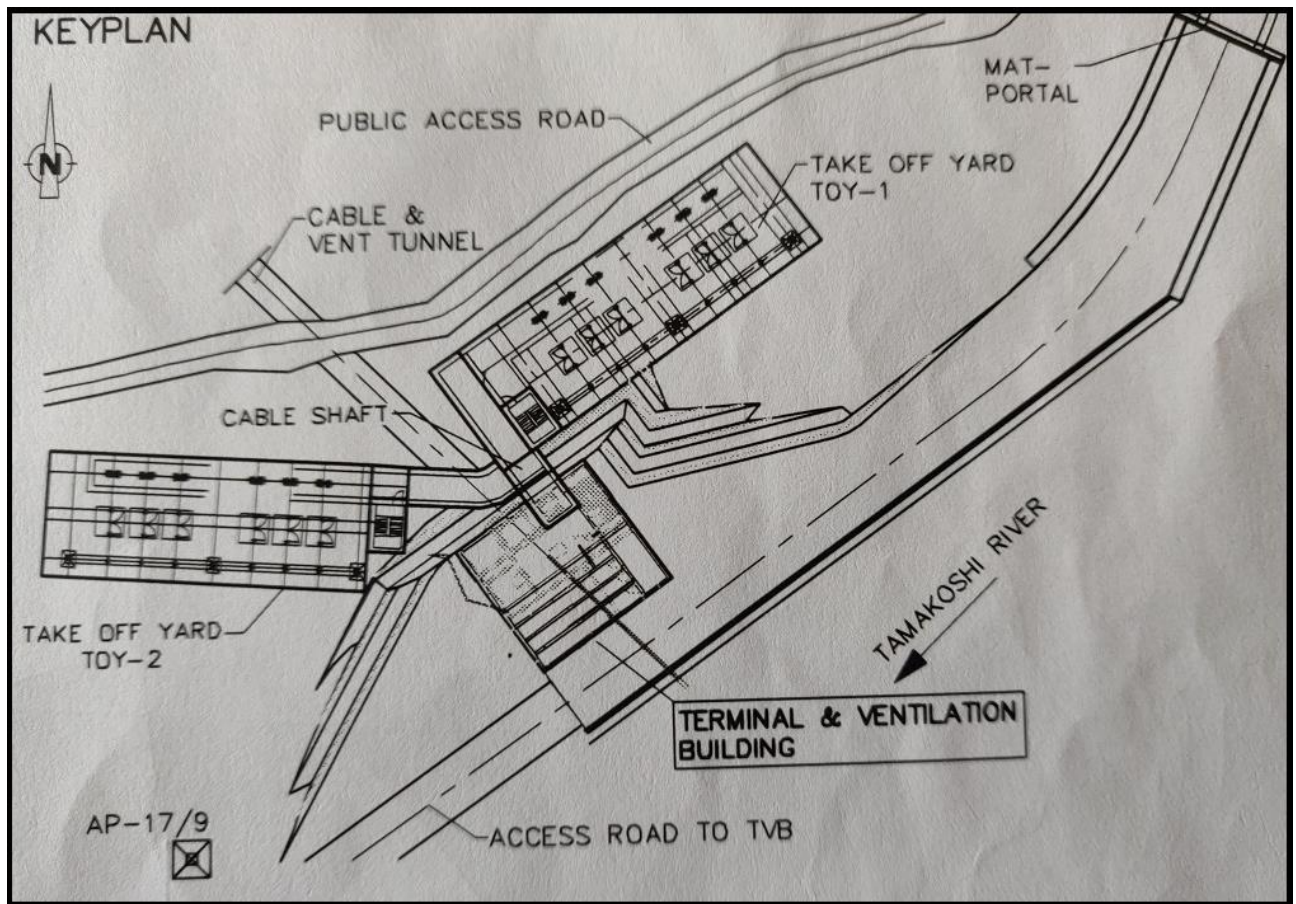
Sketch of the Plan of Terminal Ventilation Building and Surrounding Structures
